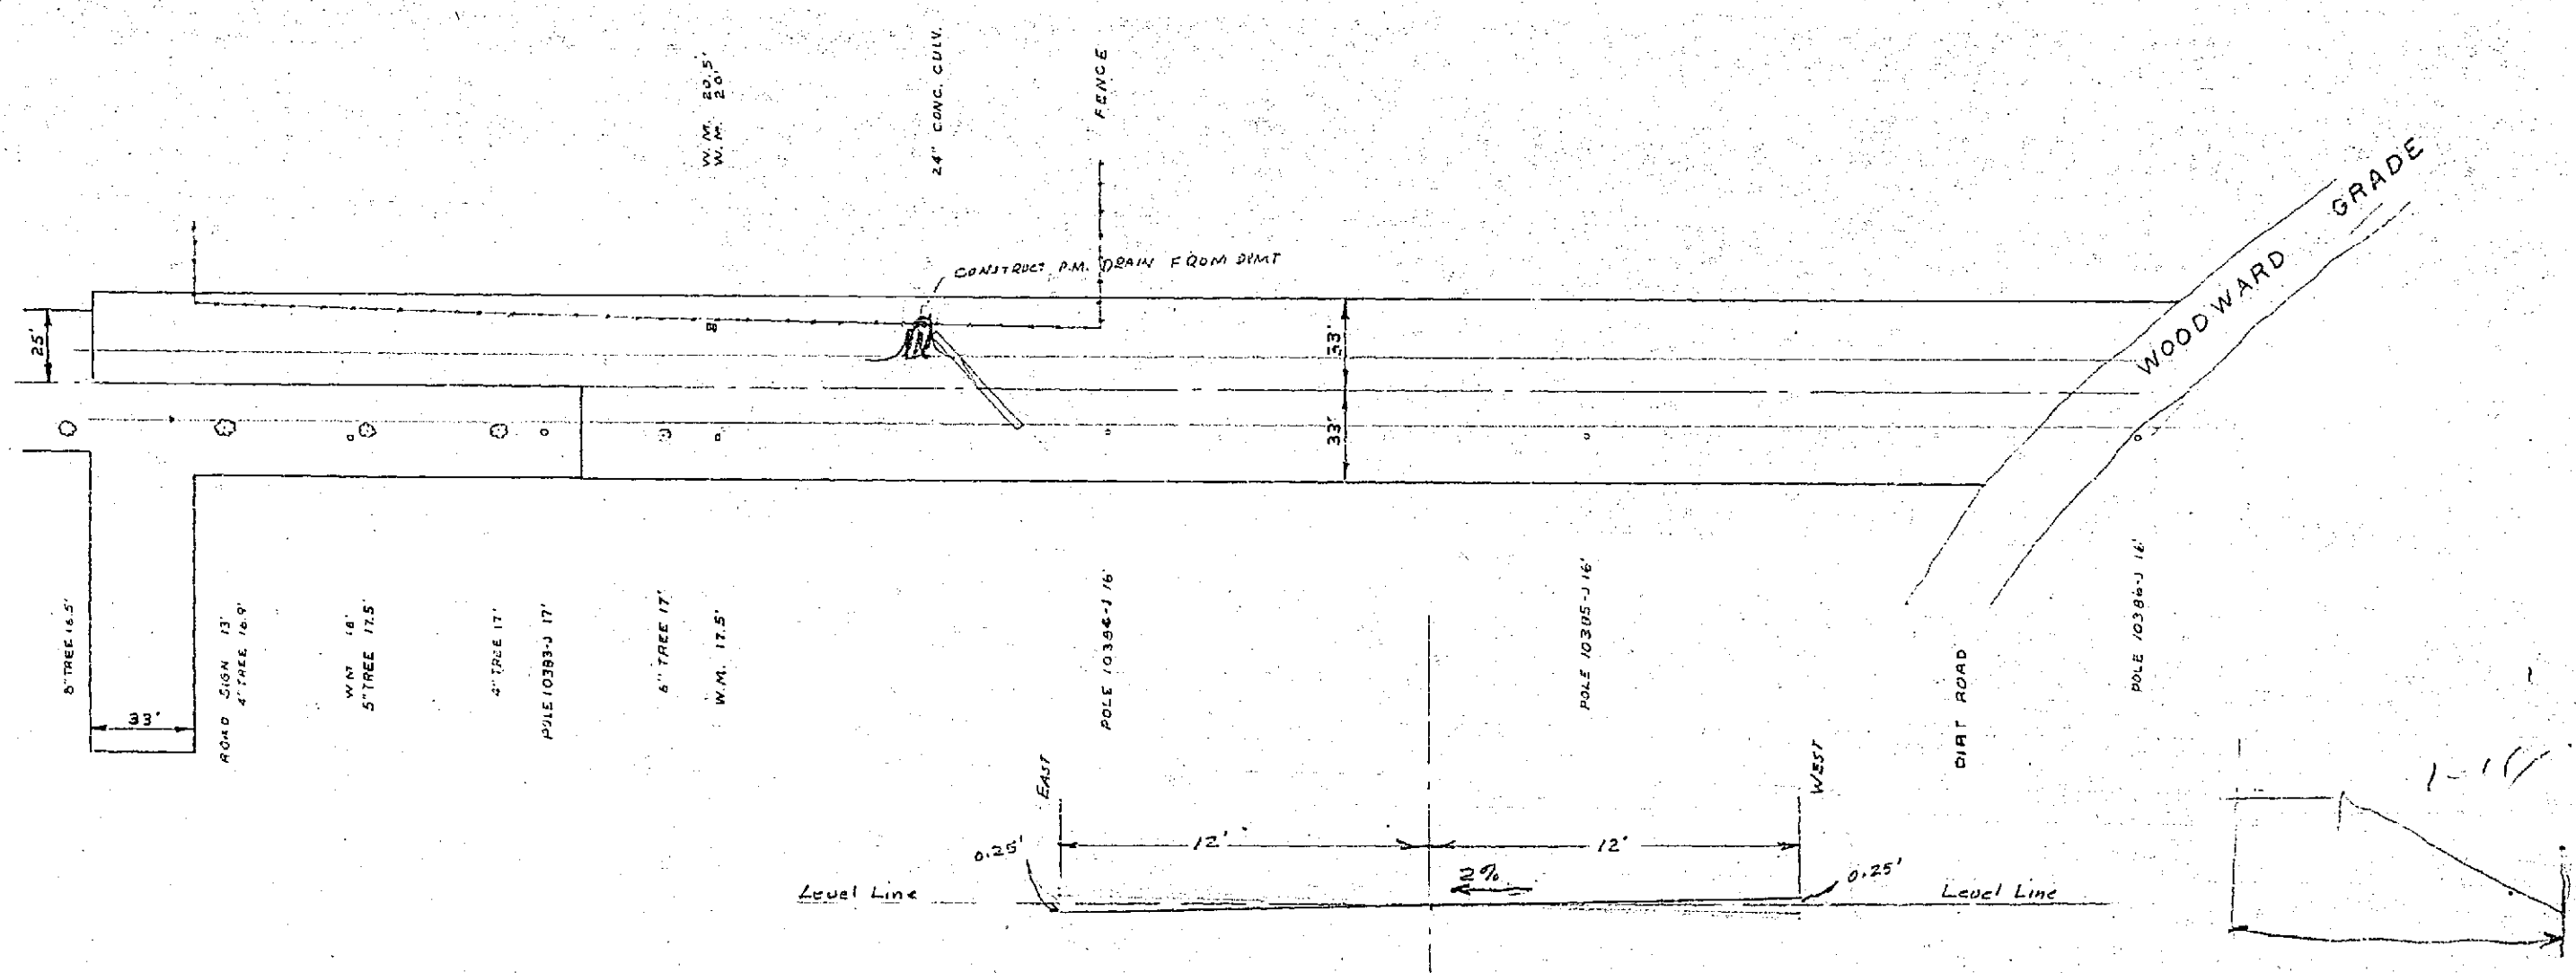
PLAN PROFILE OF R. B. H. C. STATION
